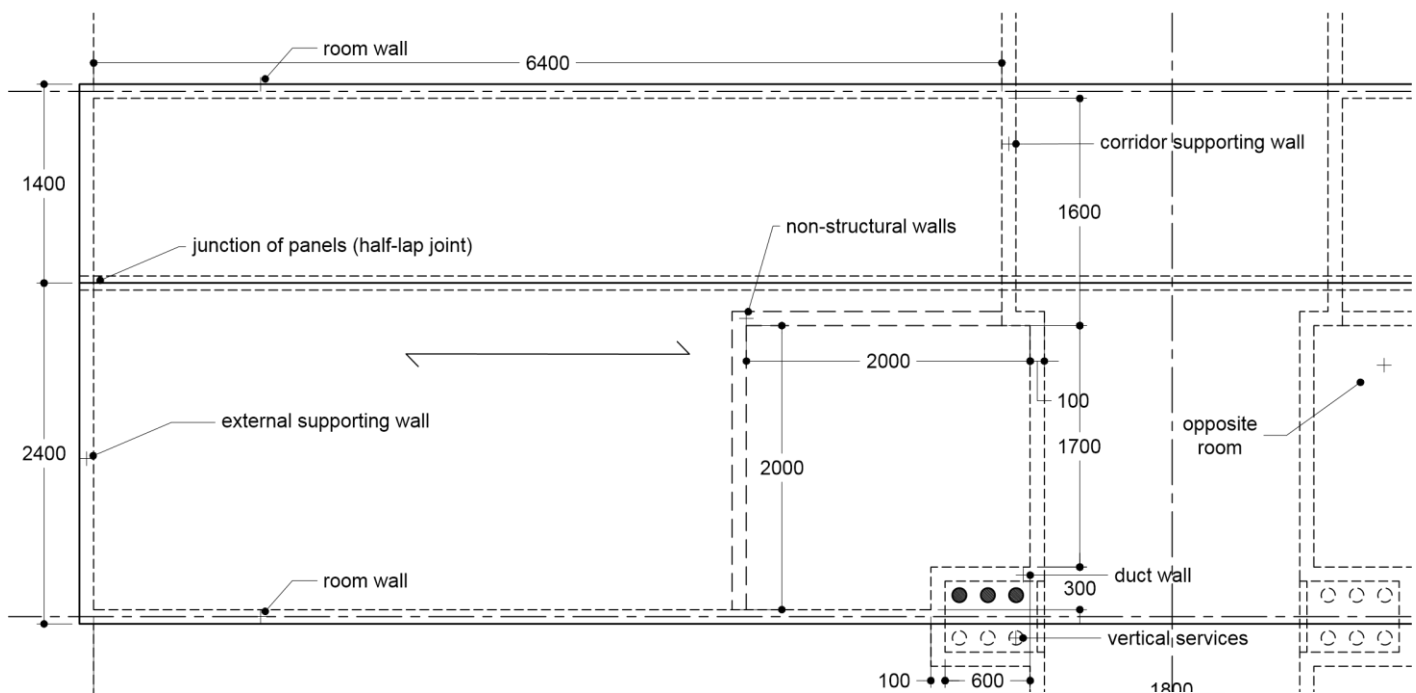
Standard modern twin-bedded hotel room with non-load bearing internal walls
